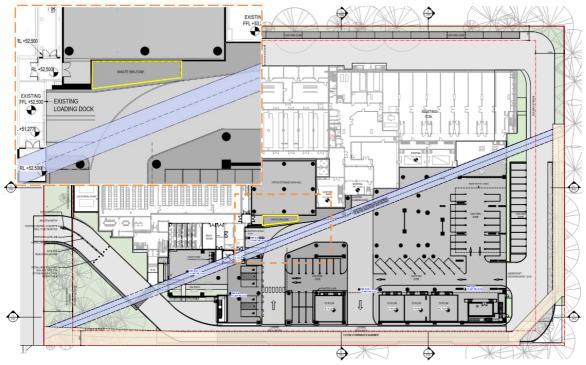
Indicative Waste Storage Area layout (Source: SLR, 2022)
